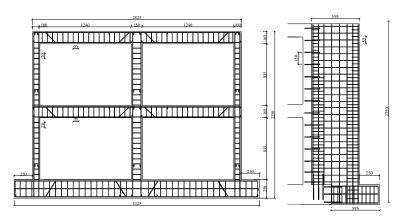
Dimensions and reinforcement layouts of RC frame and external shear wall for the 1st group tests (Arslan, 2007; Kaltakci, 2007).
